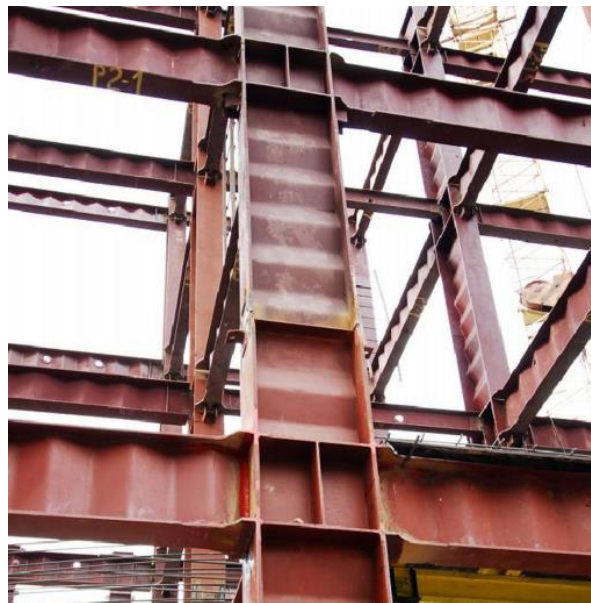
Multi-storey residential building in Almaty, Kazakhstan. The building frame is made of steel columns and beams with triangular-corrugated walls. Overlap of reinforced concrete. [6]
